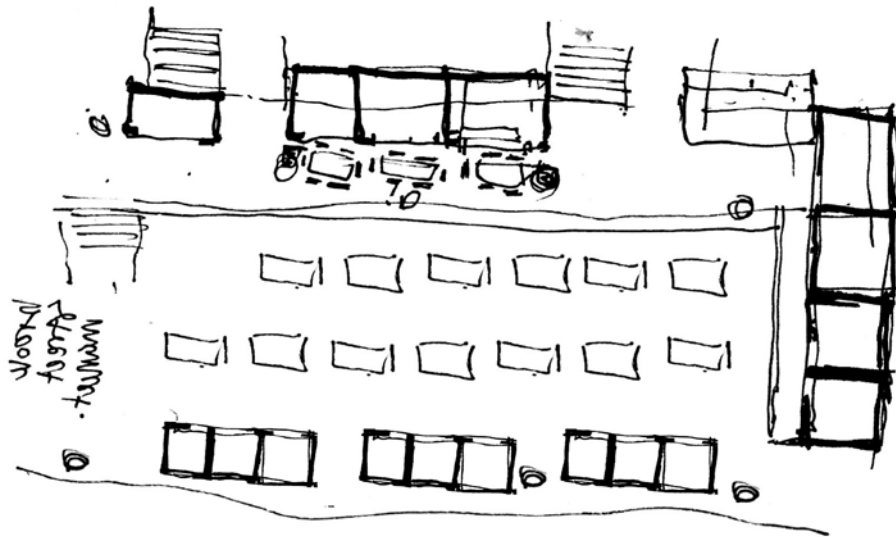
Floorplan. Brook Street Market, Warwick Junction. Kiosks create a semi permeable edge and open into an open plan central space, where traders operate under market roof. (Author)
